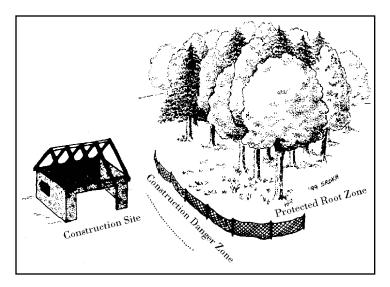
Determining the construction danger zone between the protective fence and the building site assists with final site and building design and selection of equipment to be used. Note that the tree protective fence is placed in front to prevent access and disturbance to the protected root zone.
